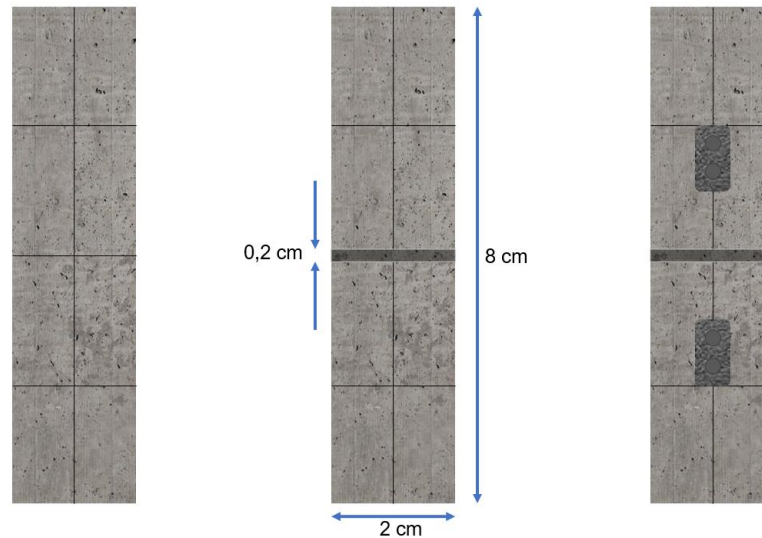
a) cement paste specimen. b) specimen with the u-notch. c) specimen with the u-notch and the arrangement to set the strain gauge.
